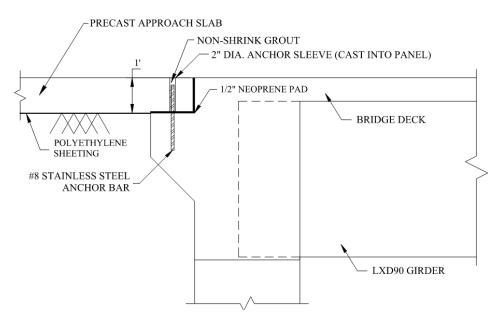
Connection to the abutment (Merritt et.al, 2007)
